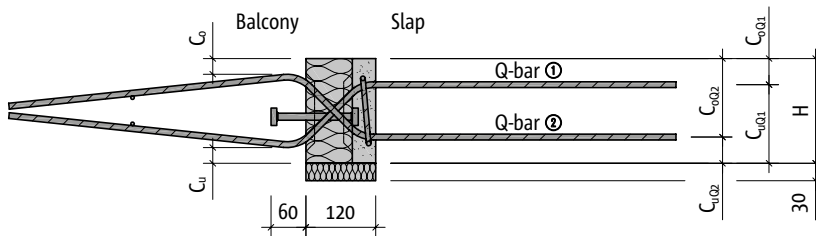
Section: Schöck Isokorb® type RQP40+RQP40
